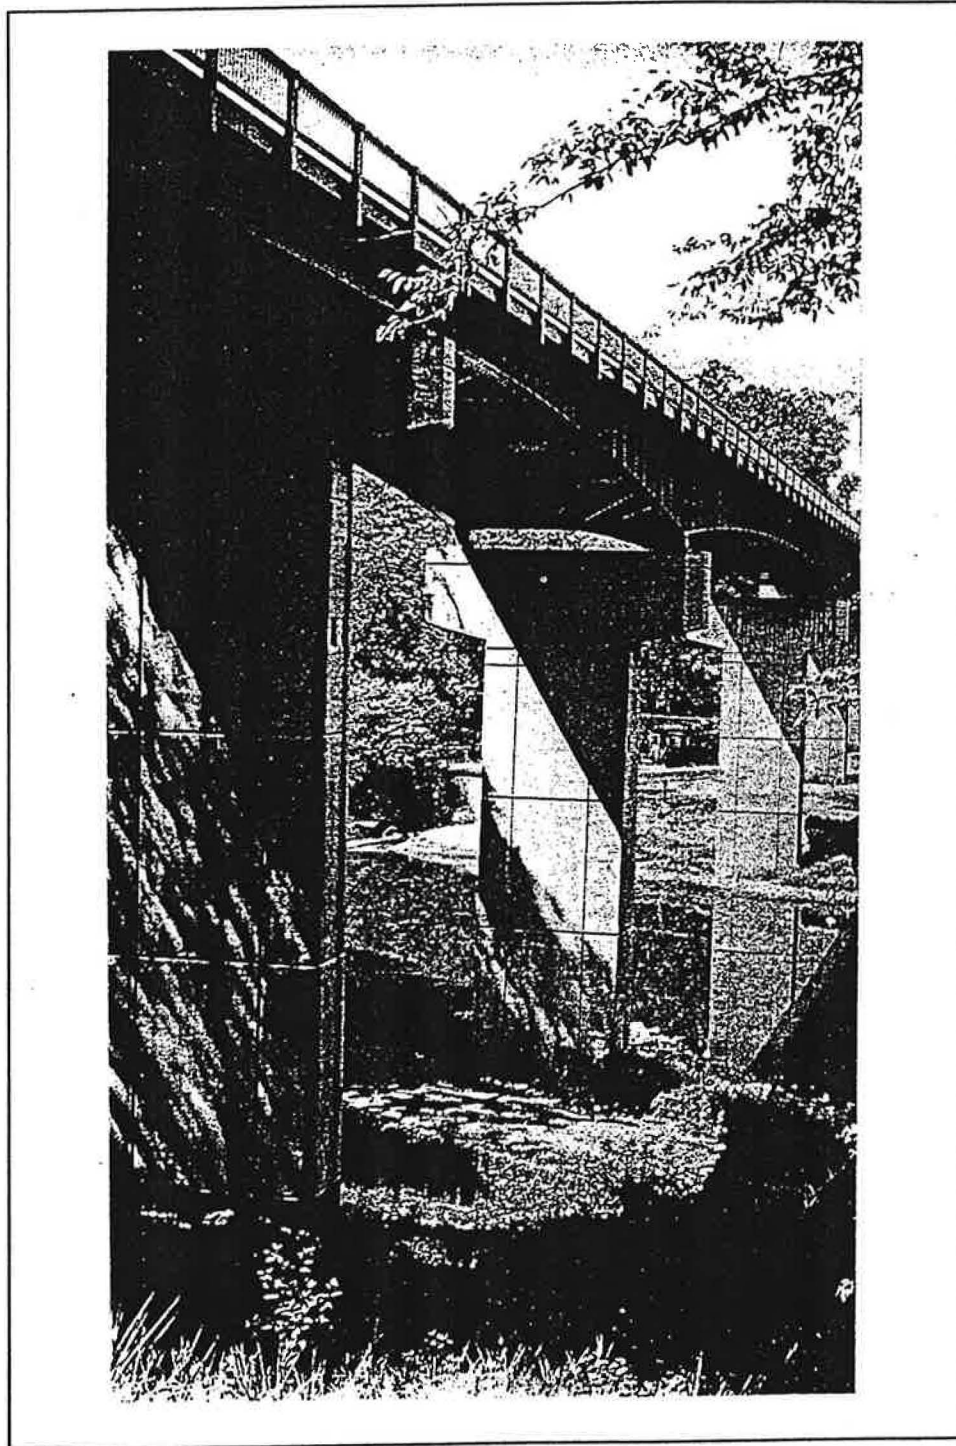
The SR 141/Tyler-McConnel Bridge (NC-587) over Brandywine Creek, 1951-52. The continuous steel deck girder bridge featured the innovative use of hammer head piers. Source: Delaware State Highway Department, Annual Report, 1951-52, p. 46.
